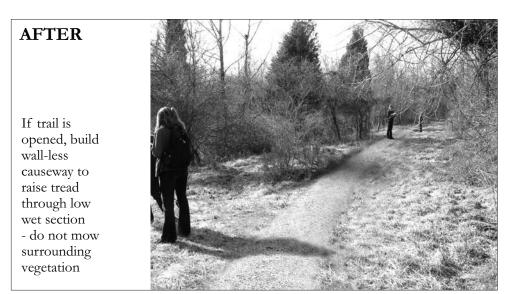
Example of a proposed wall-less causeway construction through low wet area of trail.
